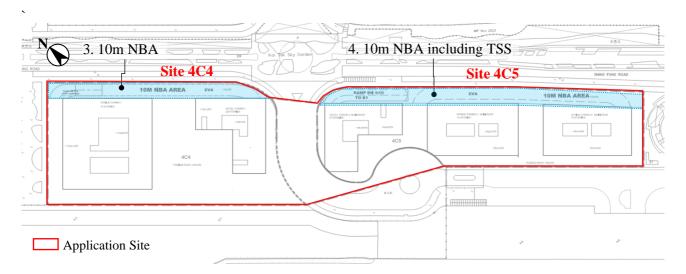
Layout plan of Sites 4C4, 4C5 and area shown as 'road' of Proposed Scheme
